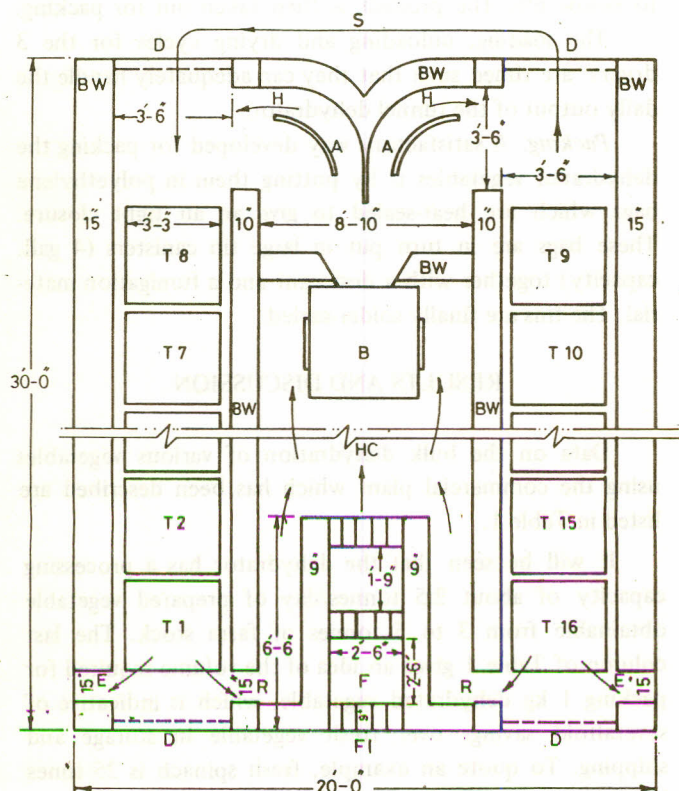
Twin tunnel dehydrator. A. Air deflector; B. Centrifugal blower; D. Doors; E. Exhaust air; F. Furnace; FI. Fresh air inlet; R. Return air duct; H. Hot air delivered by blower to tunnels; HC. Hot air chamber; BW. Burnt-brick walls; S. Trolley shifting; T1-16. Drying trolleys.
